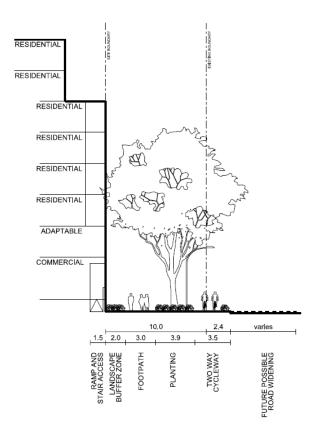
Section J - Landscaped Setback Typical Section (Lachlan Street)
